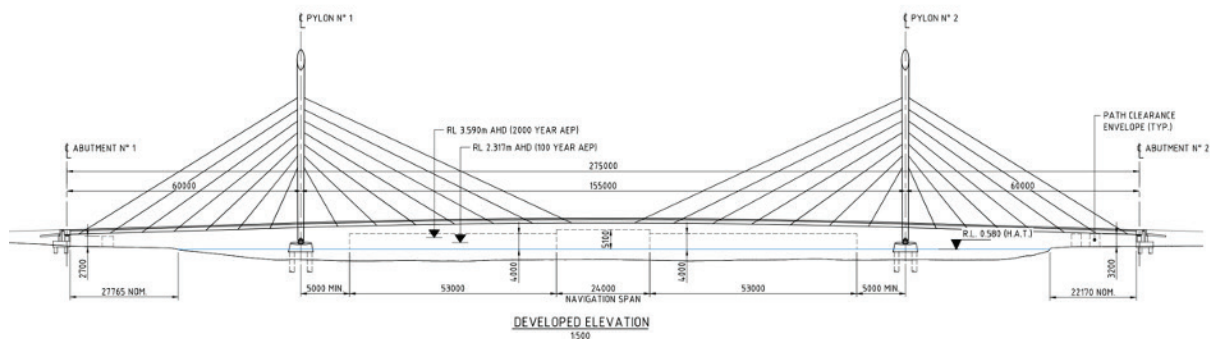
Elevation of the proposed bridge connecting Heirrisson island to McCallum Park (Source: WSP)
